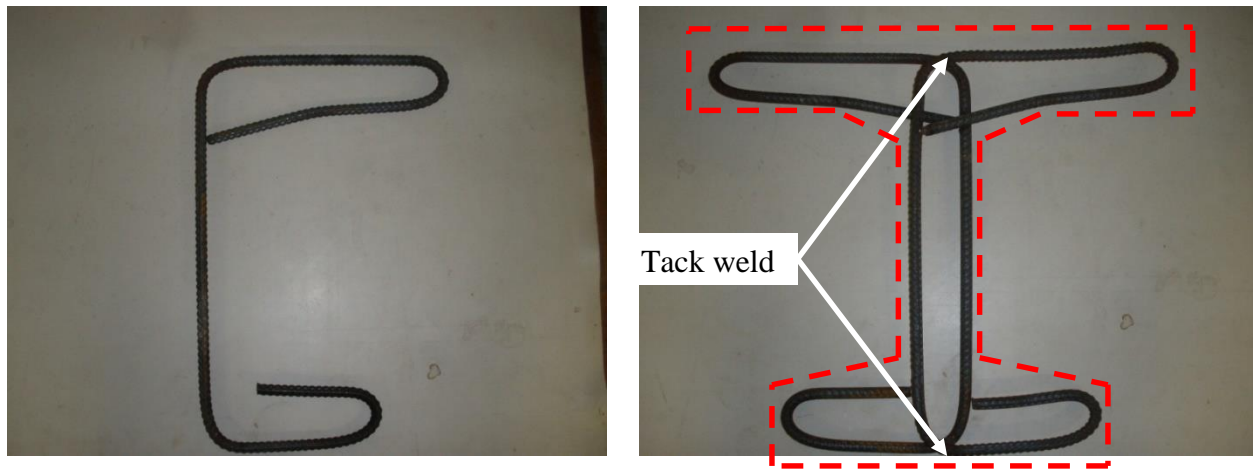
Steel stirrups of control beams other than Beam C-C-S-B
